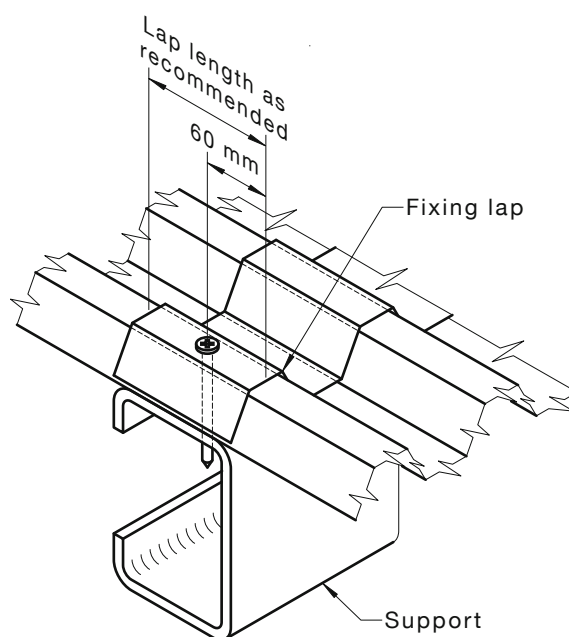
(B) PIERCE-FASTENED SHEETING AND END LAP
